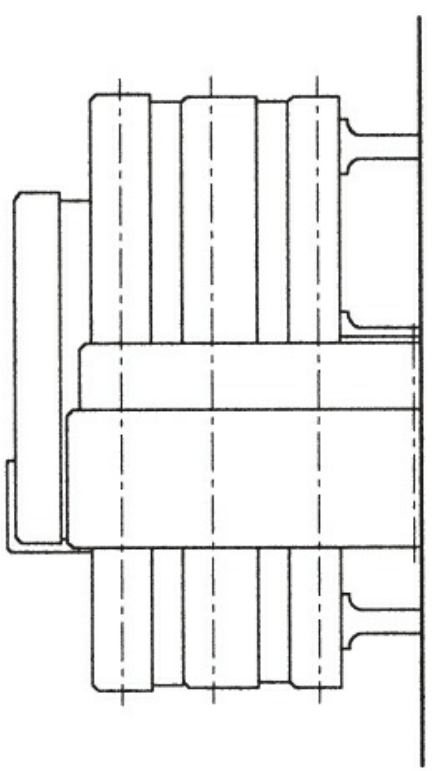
Madison Building—Stage II Working drawings—exterior elevations.
